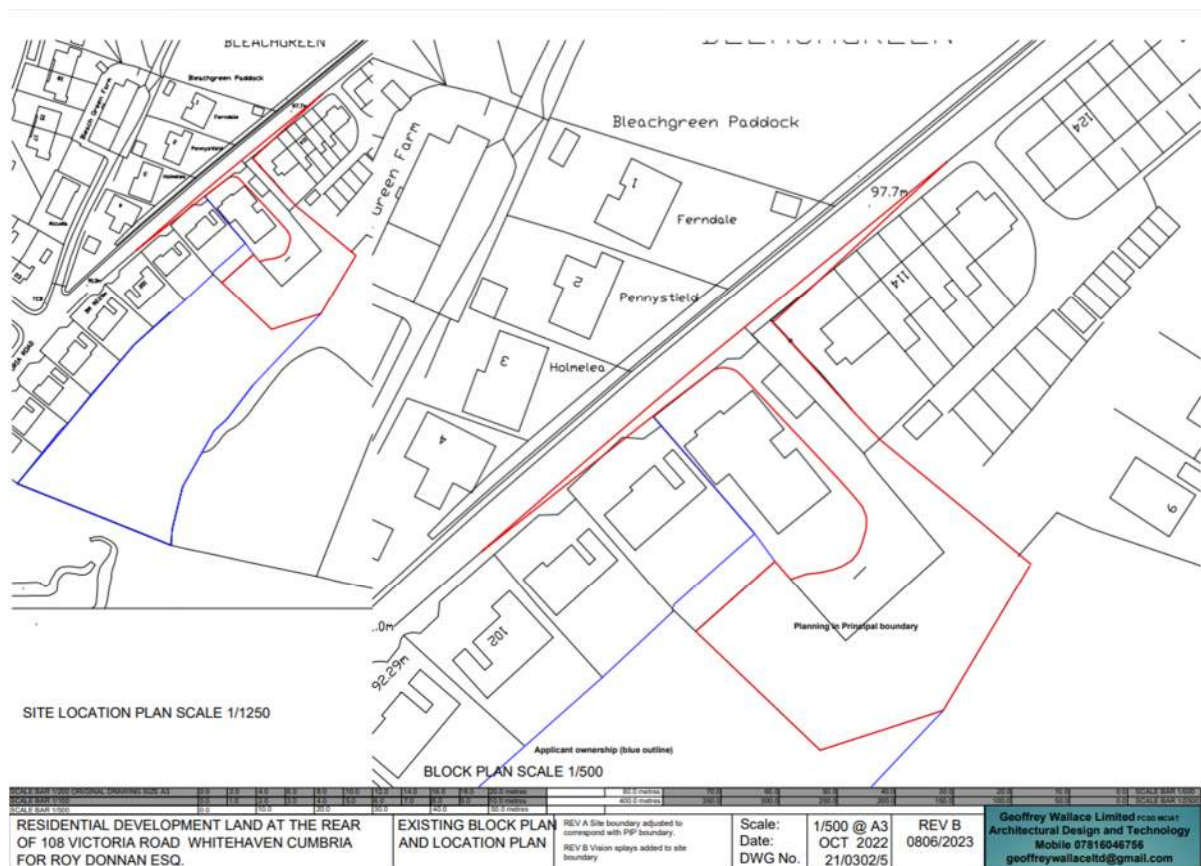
Extract from the submitted plans showing general site location within the wider built-up urban area of Whitehaven
